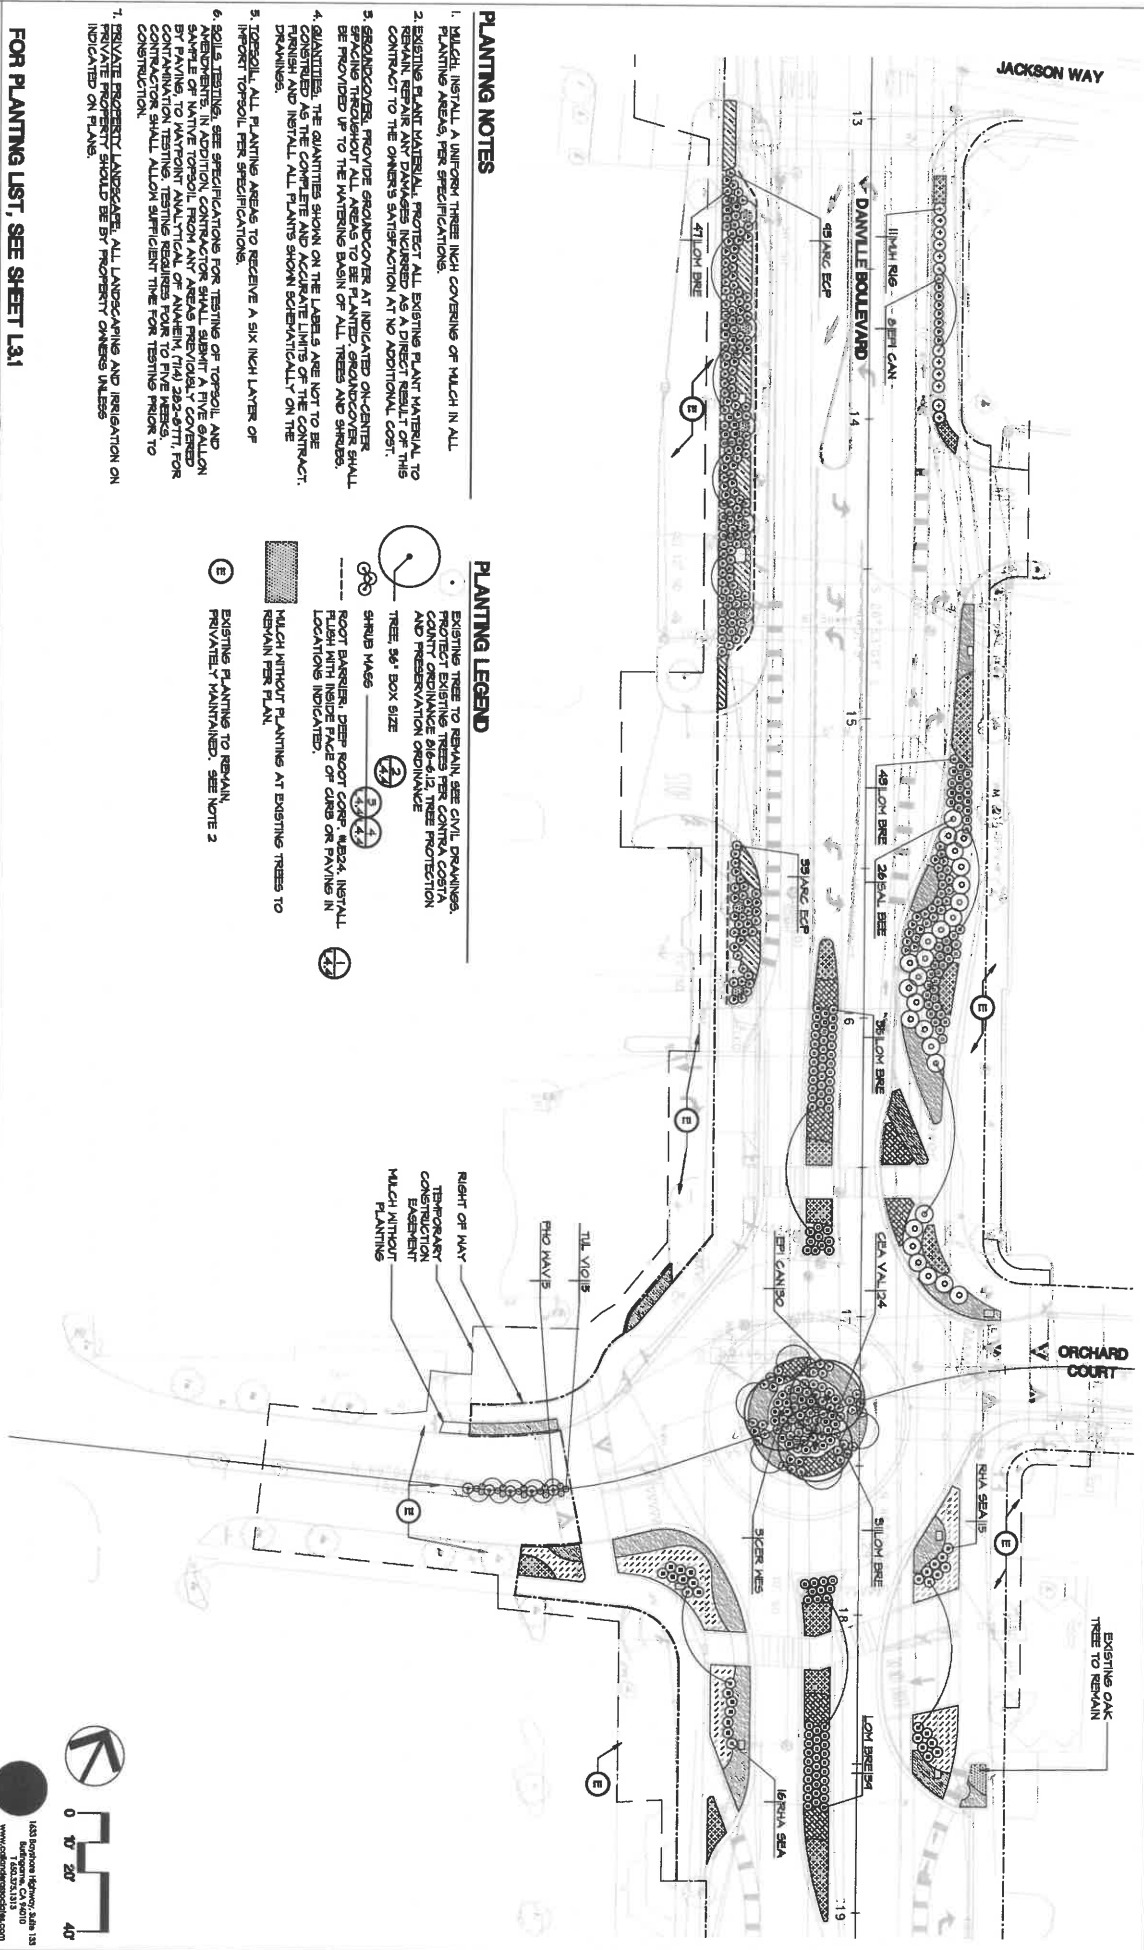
Plan View of the new roundabout at Danville Boulevard. and Orchard Ct.
